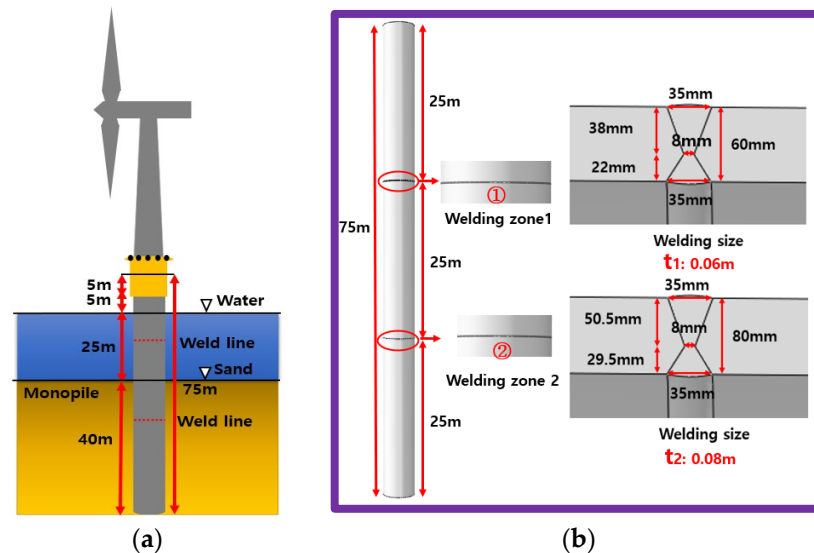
Monopile model geometry. (a) Monopile structure; (b) monopile model size with different thickness (60 mm, 80 mm) and welding joint size.
